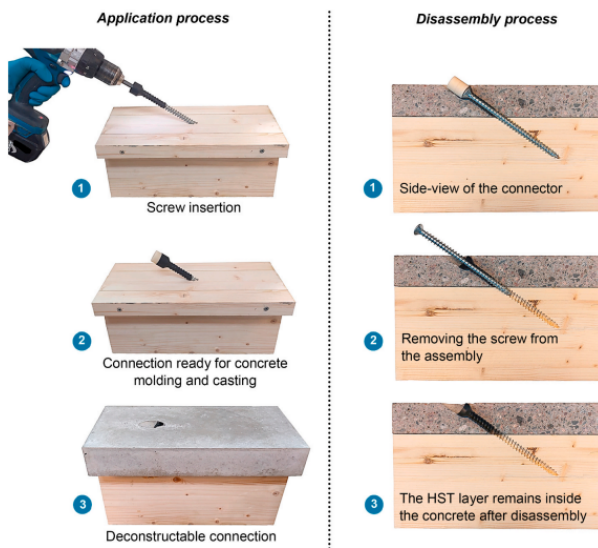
Wet to dry connection (Derikvand, 2021)
